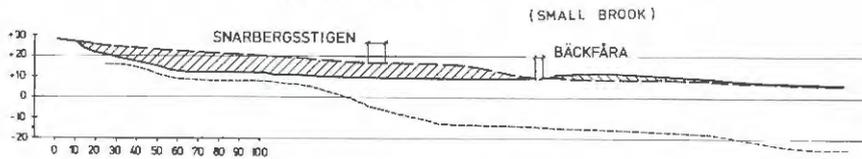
Cross sections in the slide area at Tuve before and after the slide. The location of the cross sections is shown in Fig 19.
